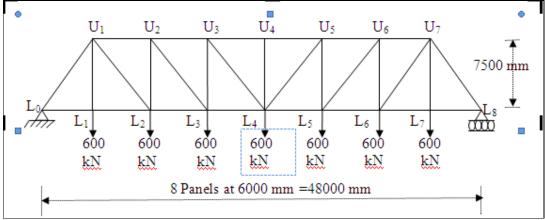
(a): Joint Loads On Statically Determinate Pratt Truss
